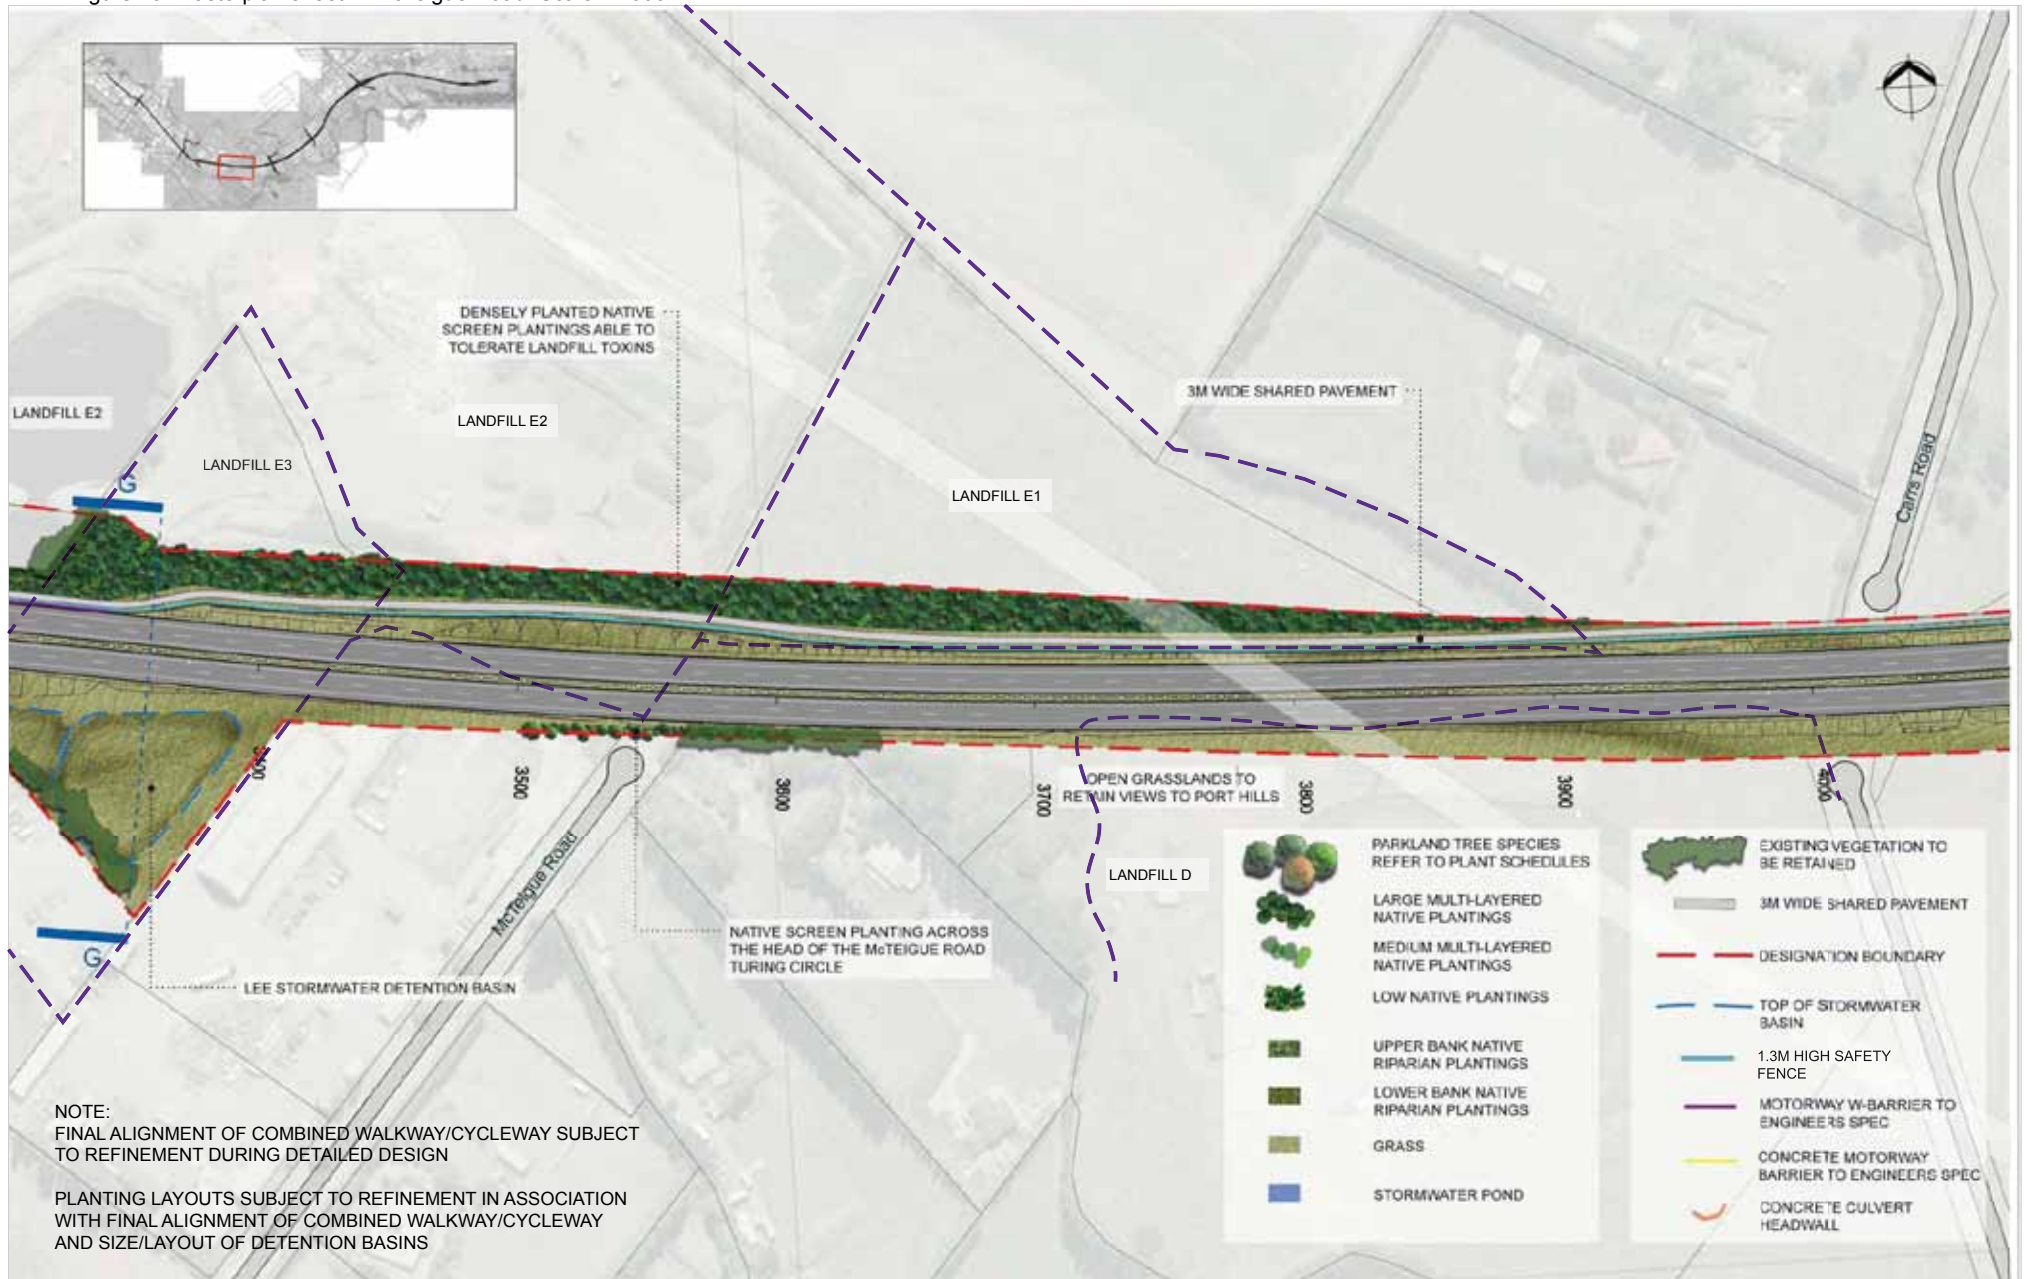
Masterplan sheet 3: Springs Road (east). Scale 1:2000
